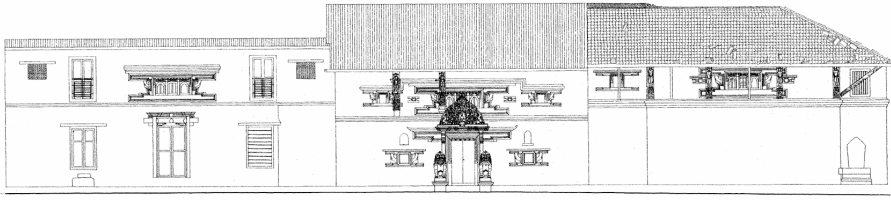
East Wing Façade: existing and proposed restoration. (Drawing by Bijay Basukala)
